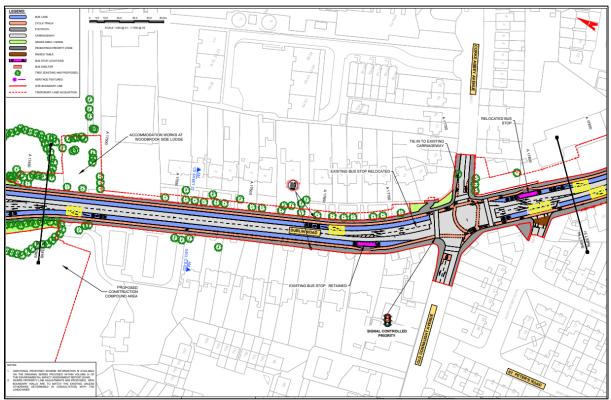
Extract from General Arrangement Drawing at Dublin Road / Old Connaught Avenue junction (Sheet 50)
